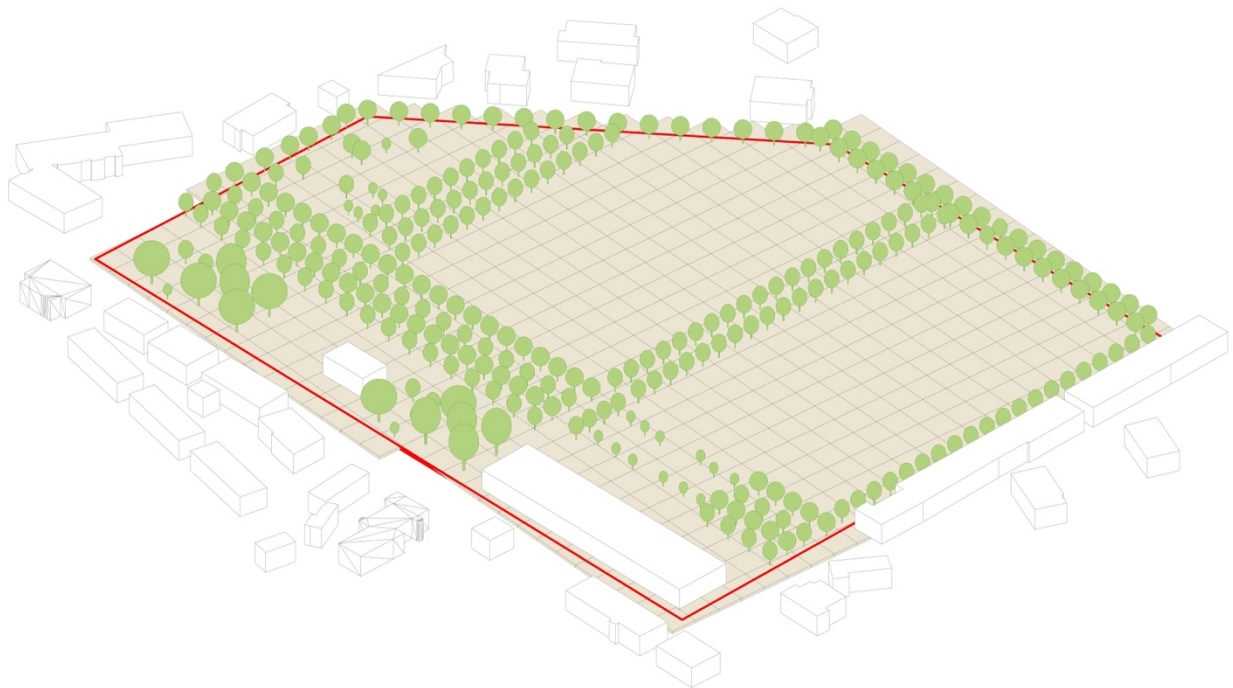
Revit elements on which the verification process will be applied: Planting component overlapped on Floors GIS-informed floors
